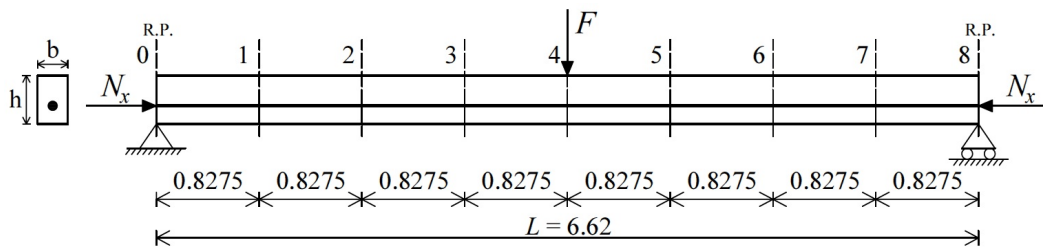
Test layout with locations of the instrumented sections of the LVDT sensors (values in meters).
